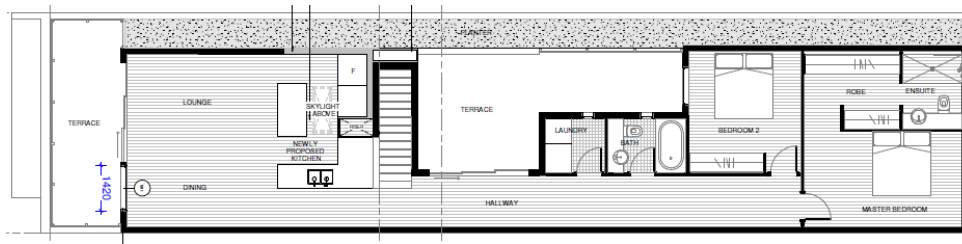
Proposed level 2 plan - 7/274 Arden Street, Coogee (Source: Place Studio)
